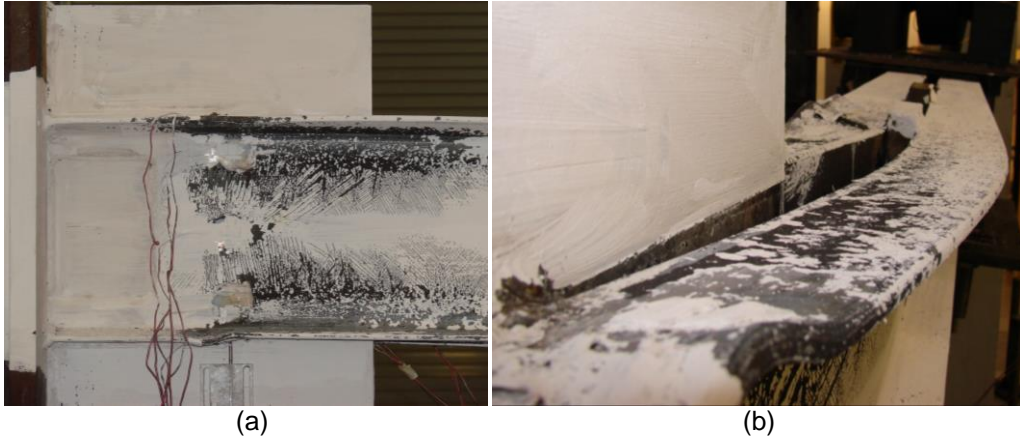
(a) Severe Flange Buckling near the End of the Weld of 2C12-2 and (b) Bulging of the Channels
